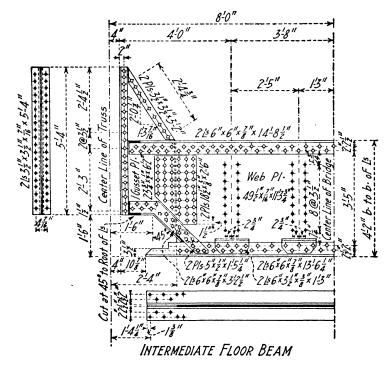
INTERMEDIATE FLOORBEAM CONNECTION. A. T. & S. F. RY.
